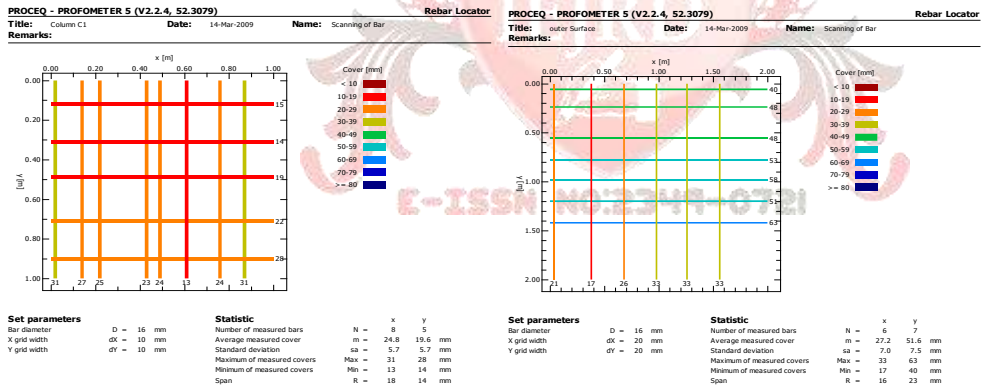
Details of reinforcement in column C1 (first floor) & water tank container
